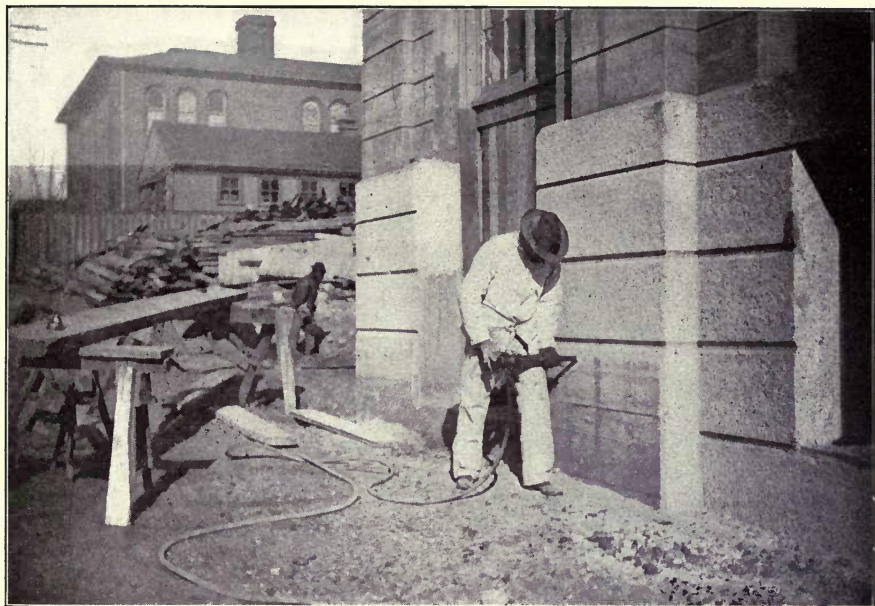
Tooling the Surface of Friedenwald Building Walls. (See p. 196.)
